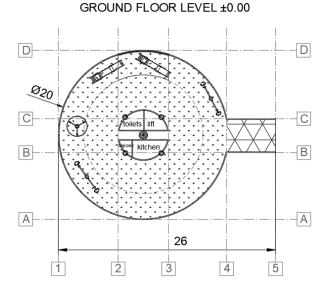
Horizontal cross-section of the structure, at ground-floor level
